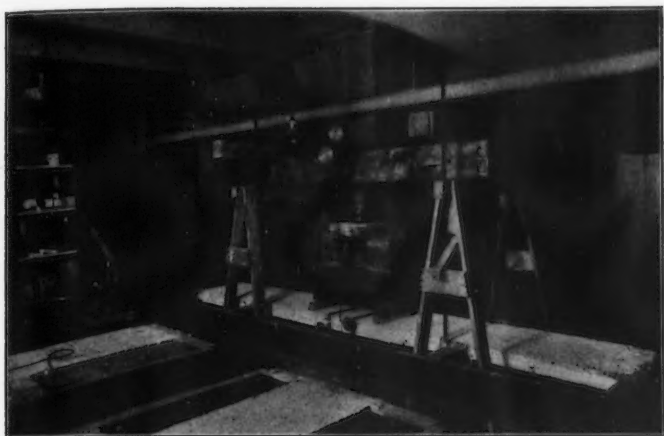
TESTING "RESTRAINED" SLAB WITH HYDRAULIC JACK. NOTE GAUGES AND RECORDING INSTRUMENTS IN PLACE.
